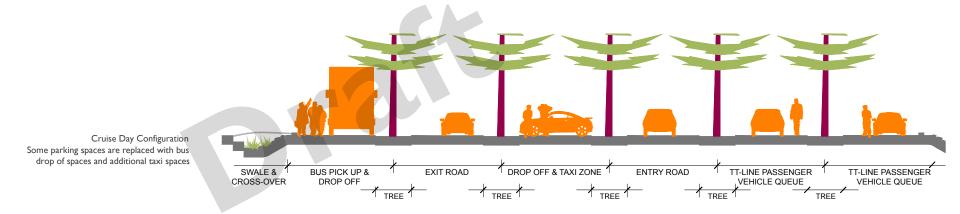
| Indicative cross section through Pier Park space showing passenger drop off
